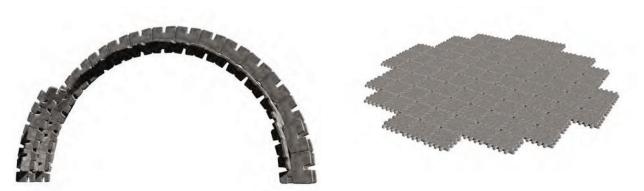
Small, modular panel-derived vault arch structure may require temporary scaffolding during assembly (left), and landing pad constructed of prefabricated pavers laid in place (right)
